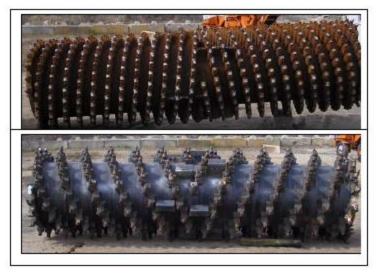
Micro-milling Drum (top) and Conventional Milling Drum (bottom)
